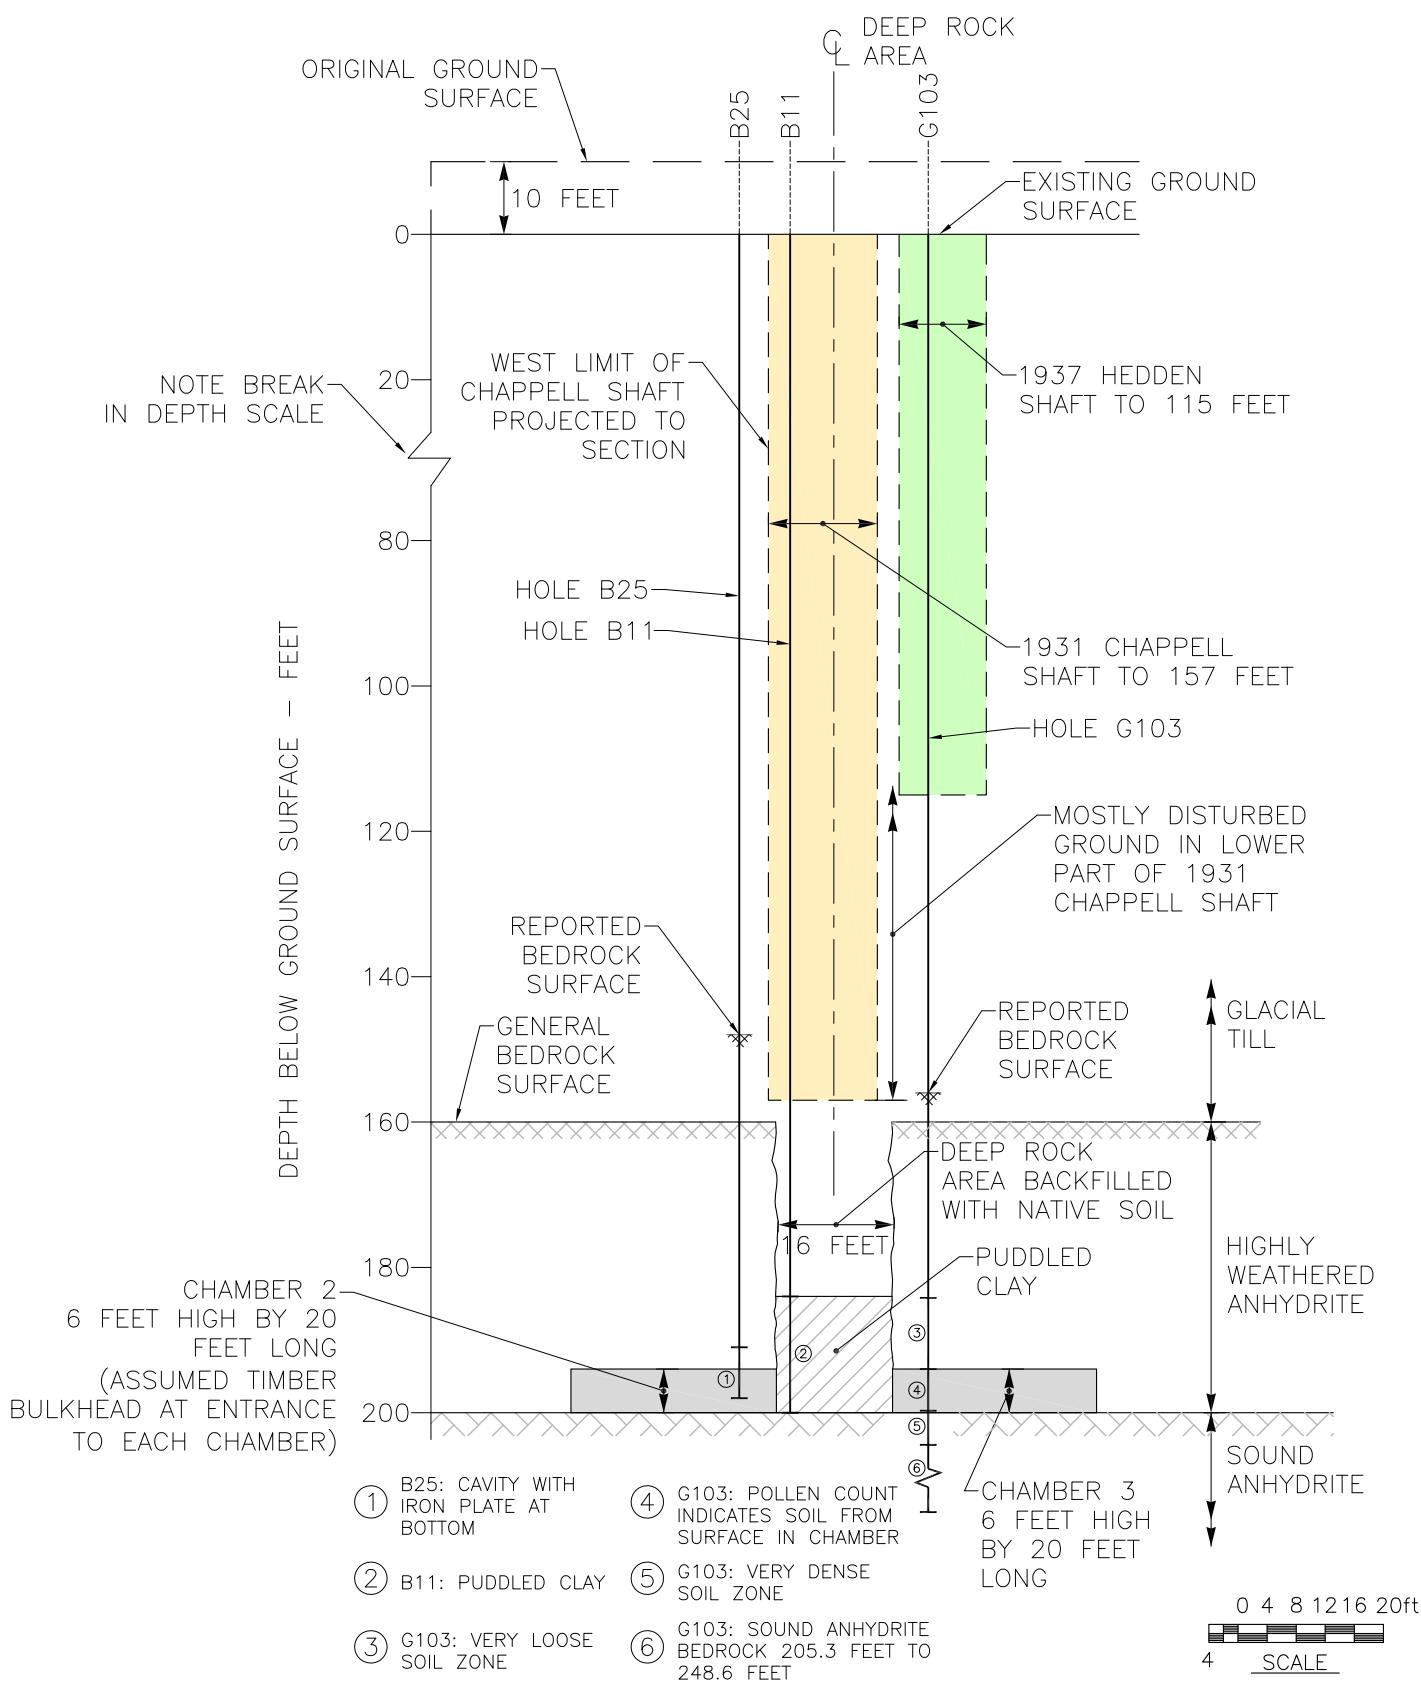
SECTION B-B THROUGH DEEP ROCK AREA AND CHAMBERS 2 AND 3 (LOOKING NORTH)
